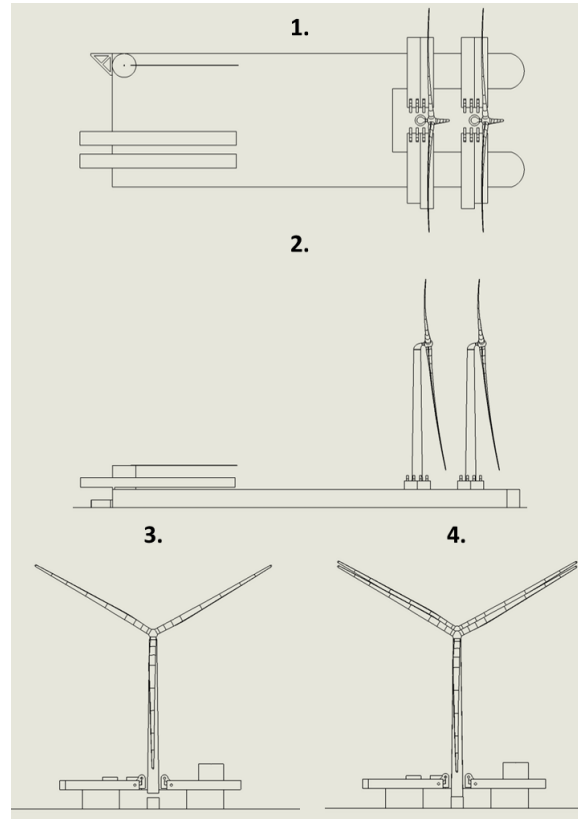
Storyboard visualising the 4 steps for the installation of WTGs on spar foundations with Concept 13
